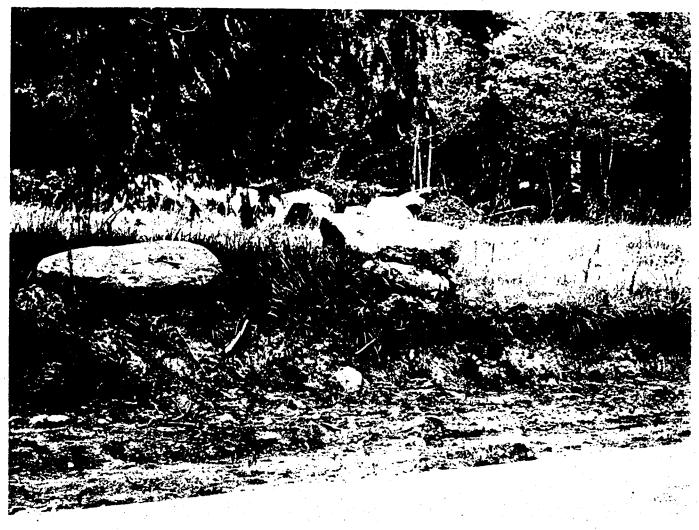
Large stones and boulders excavated during street construction on Jory stony silt loam.
